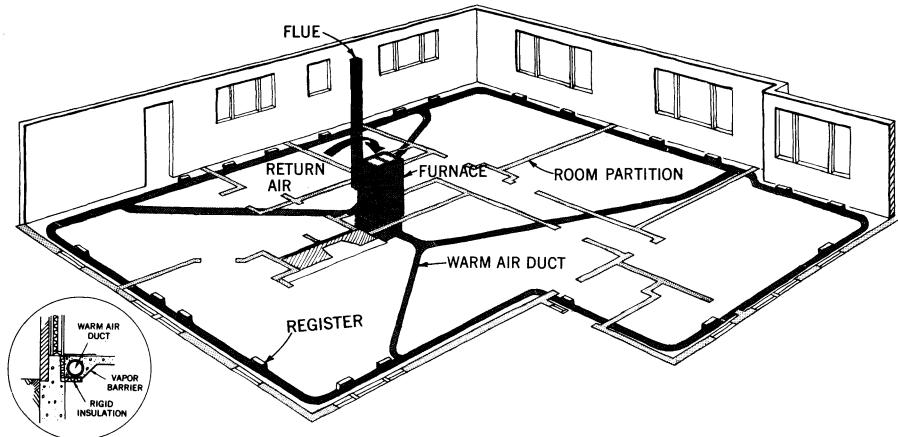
Perimeter-loop heating systems are often used in basementless houses built on a concrete slab. The inset shows duct-slab-foundation construction details.
